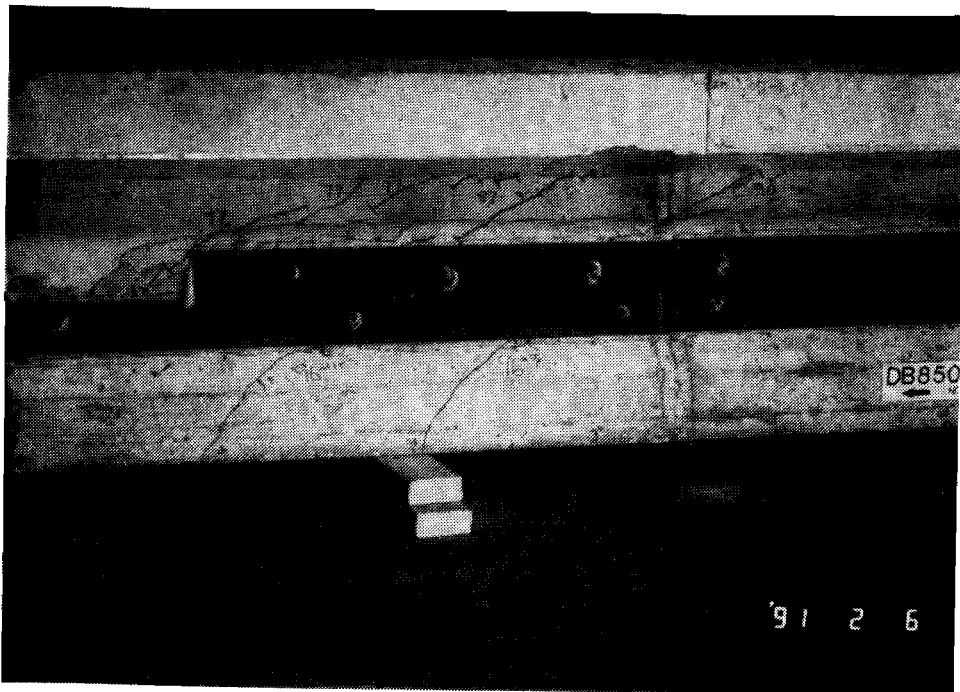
Web Shear Cracking, Test DB850-2A (G)
